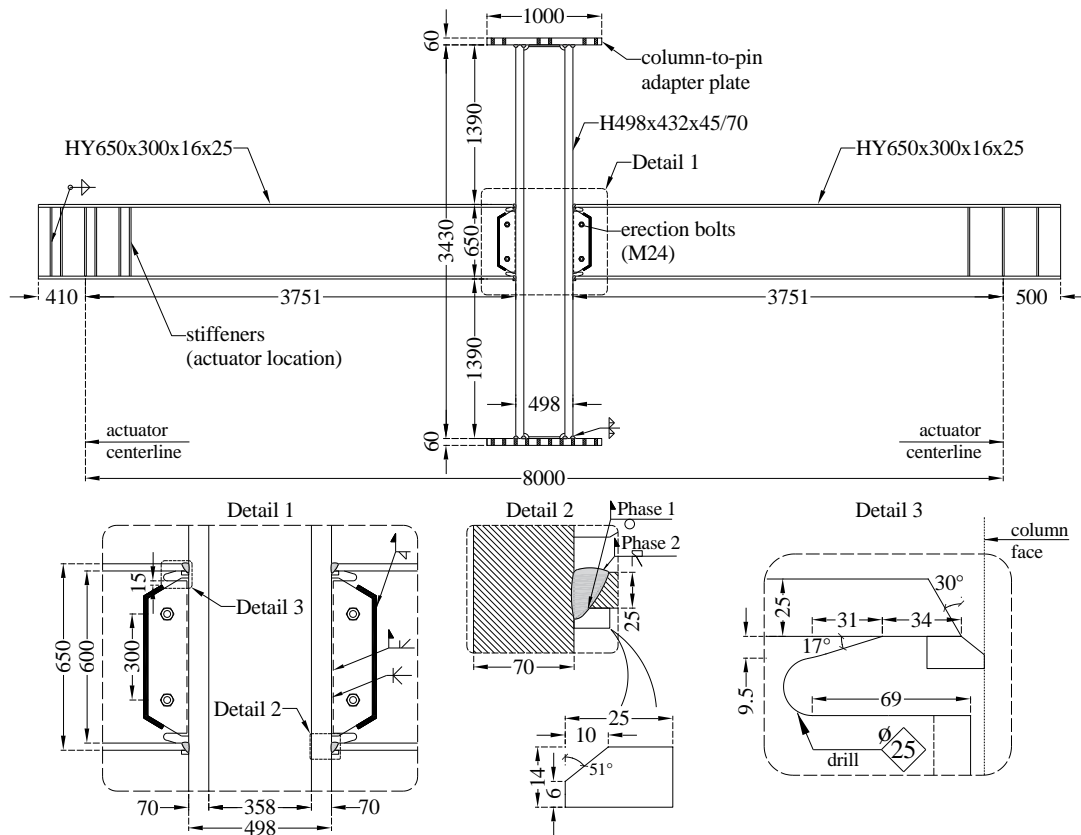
Overview of the beam-to-column connection (unit: millimeters).
